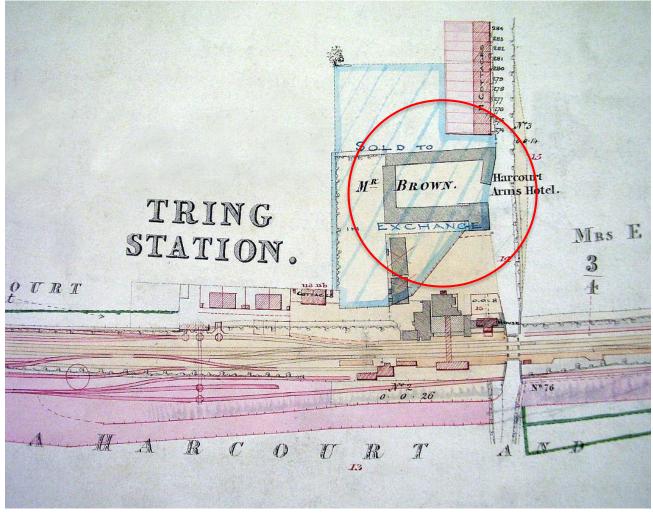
1870s plan of Tring Station and associated buildings. Posting House (formerly Harcourt Arms Hotel) highlighted in red.
